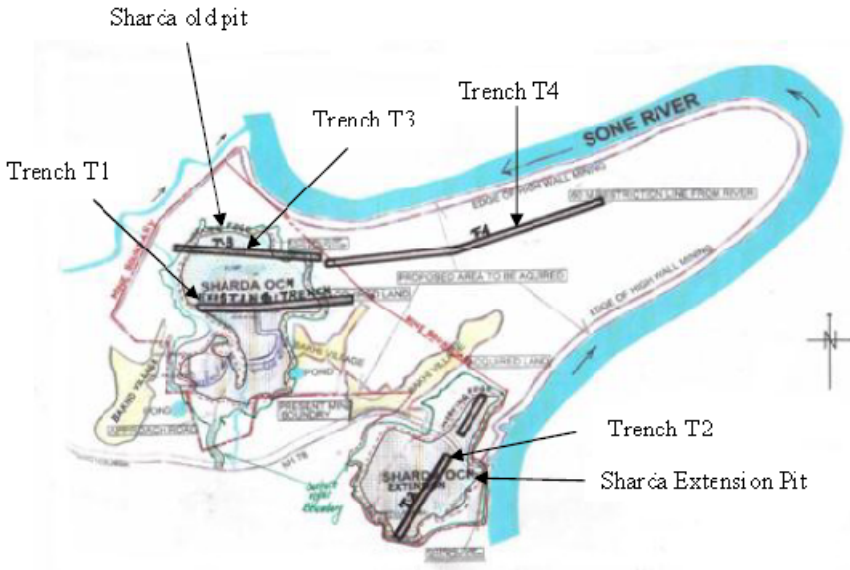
Mine plan showing location of trenches in Sharda opencast
